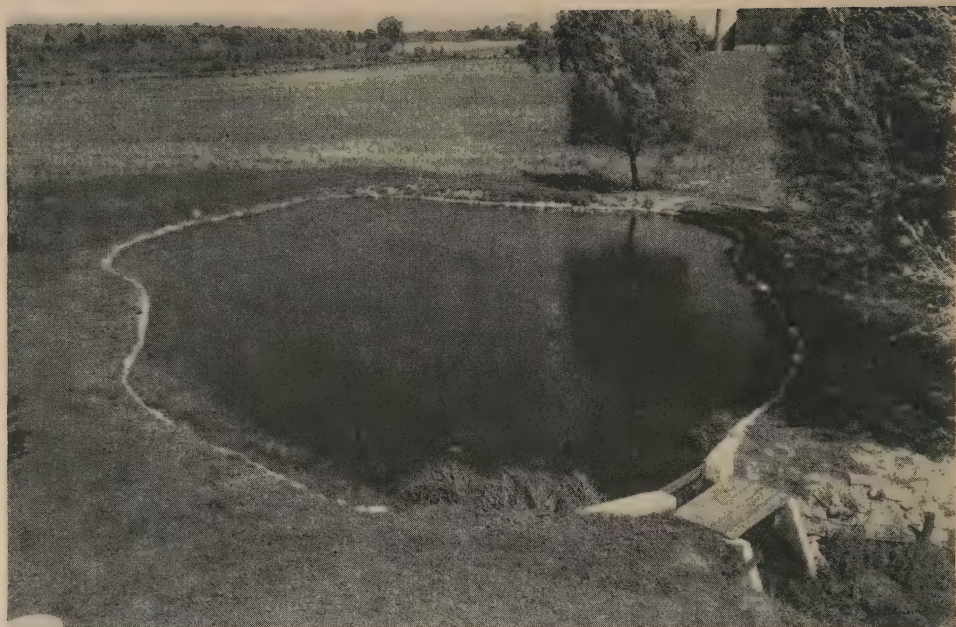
The above photograph is of a well-managed by-pass pond. The concrete spillway section and stop logs were put in before the pond was adapted to the by-pass type, and are actually unnecessary. The inlet to the pond is beside the tree on the far side.
